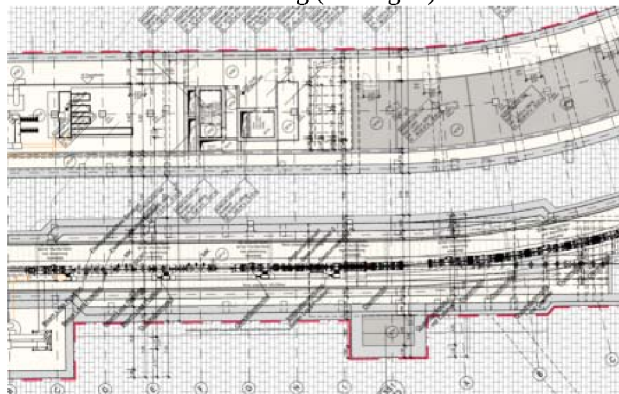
Layout (2011) of extraction section of SIS100 tunnel with beam tunnel (below) and maintenance tunnel (above).
